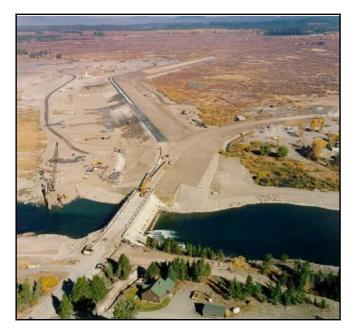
North-facing aerial view of Jackson Lake Dam under construction.
